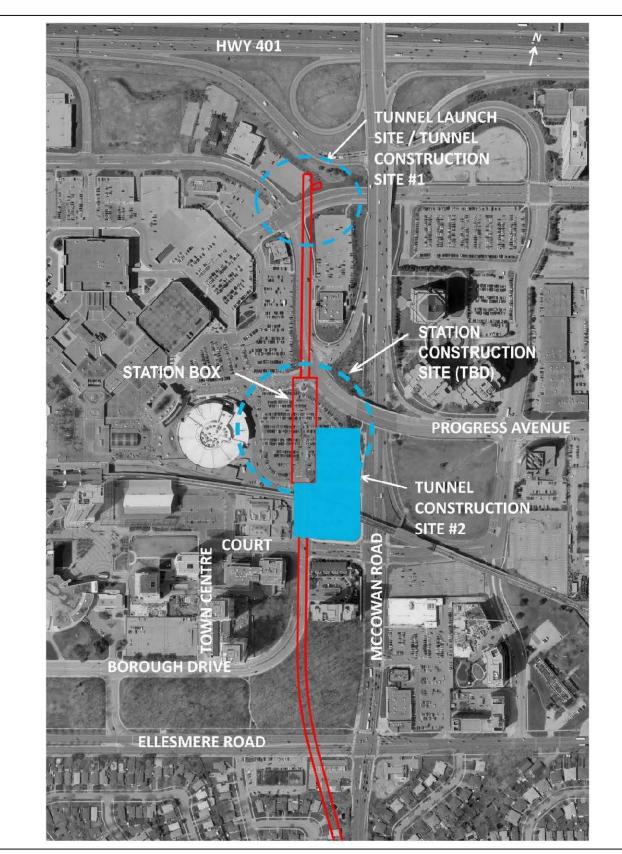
Proposed Tunnel Work Sites at Scarborough Town Centre
